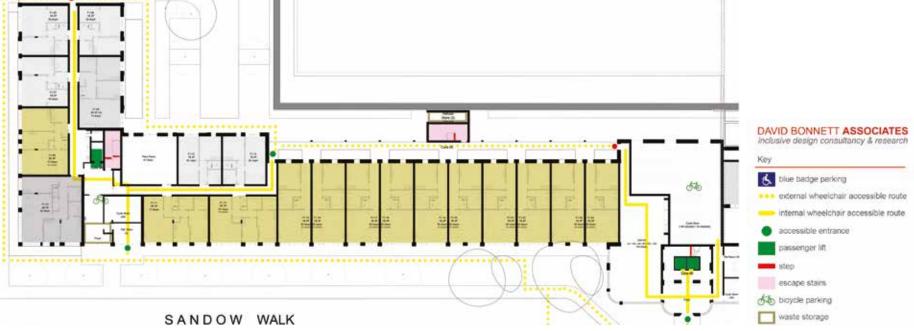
Block F1 General Arrangement - Ground floor level
